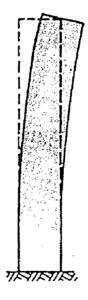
Deformation Pattern of Shear Wall Due to Lateral Forces (20)
